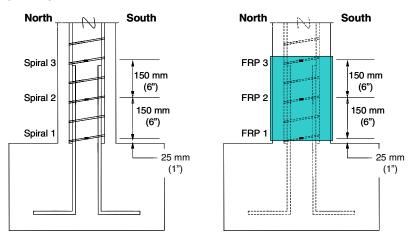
Strain Gage Location in Transverse Reinforcement and FRP Jackets
